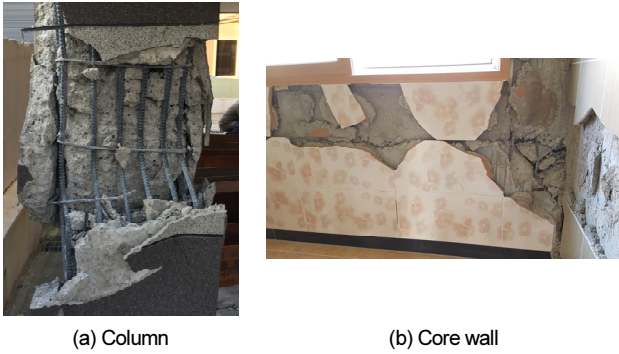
Damage in piloti-type buildings at Pohang earthquake
